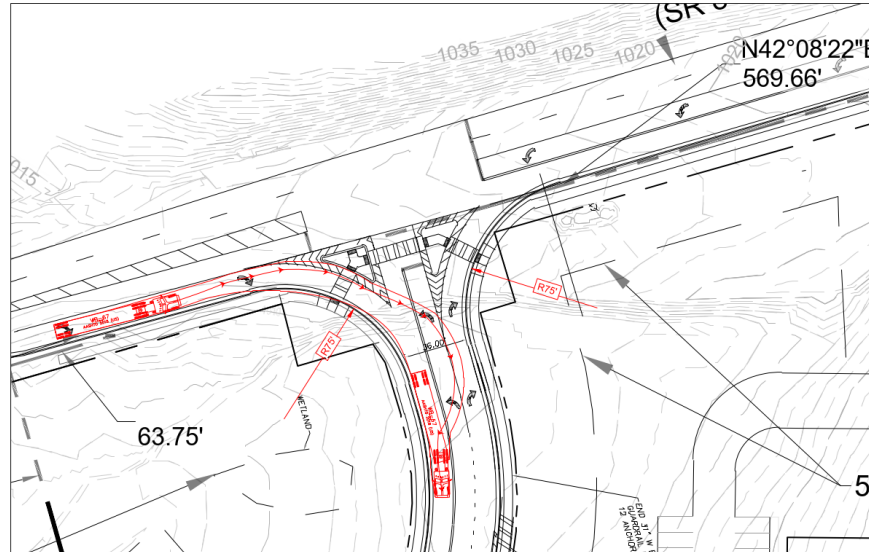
Winder Highway (SR 8/US 29) at Stanley Road – Eastbound Right (Entering Truck)
